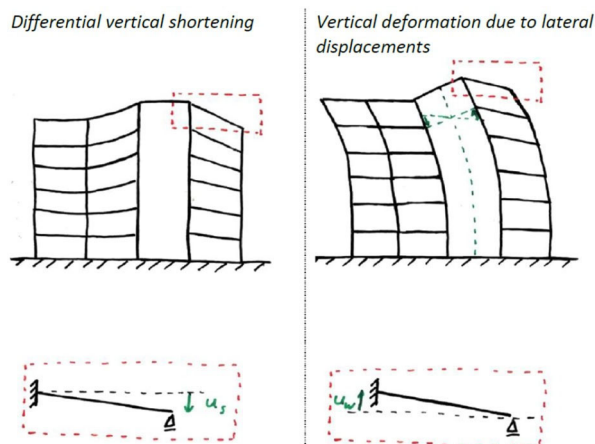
The effect of differential vertical shortening (DVS) of a concrete core and timber columns (left) and vertical deformations due to wind loads (right).
